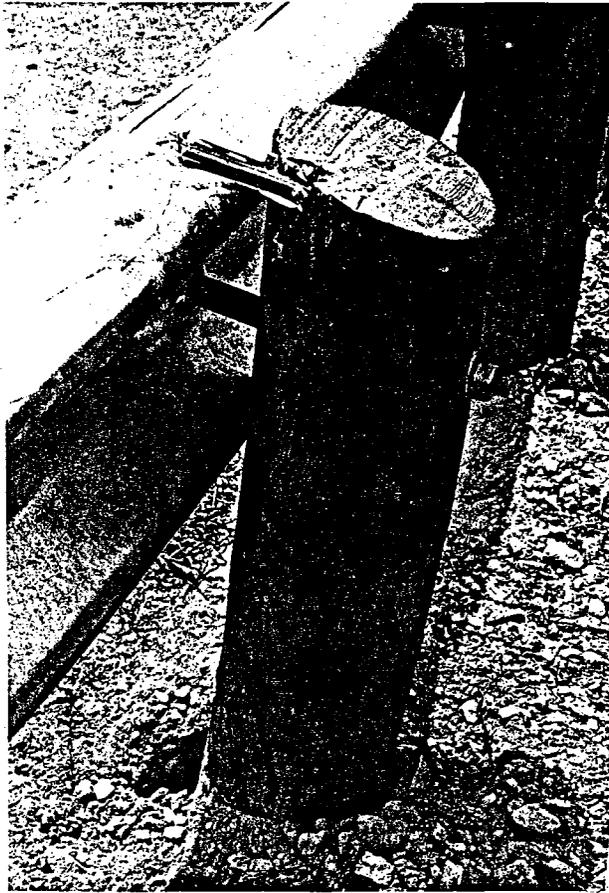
EVIDENCE OF SNAGGING ON POSTS AND CONCRETE WALL
